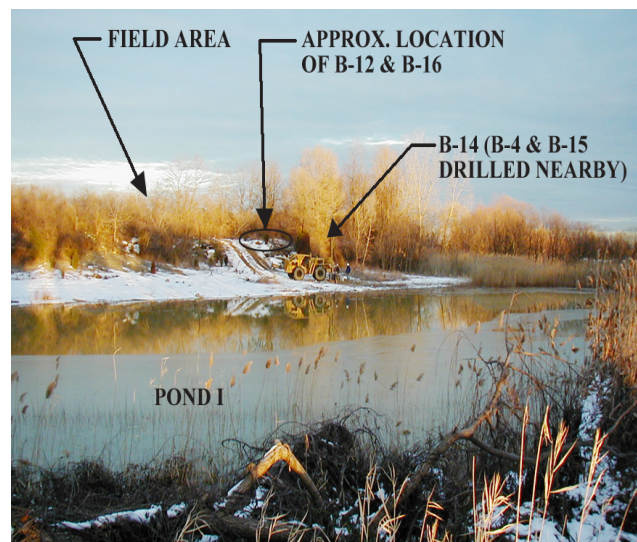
Approximate boring locations in Pond 1 area. View from slurry pond dike.
